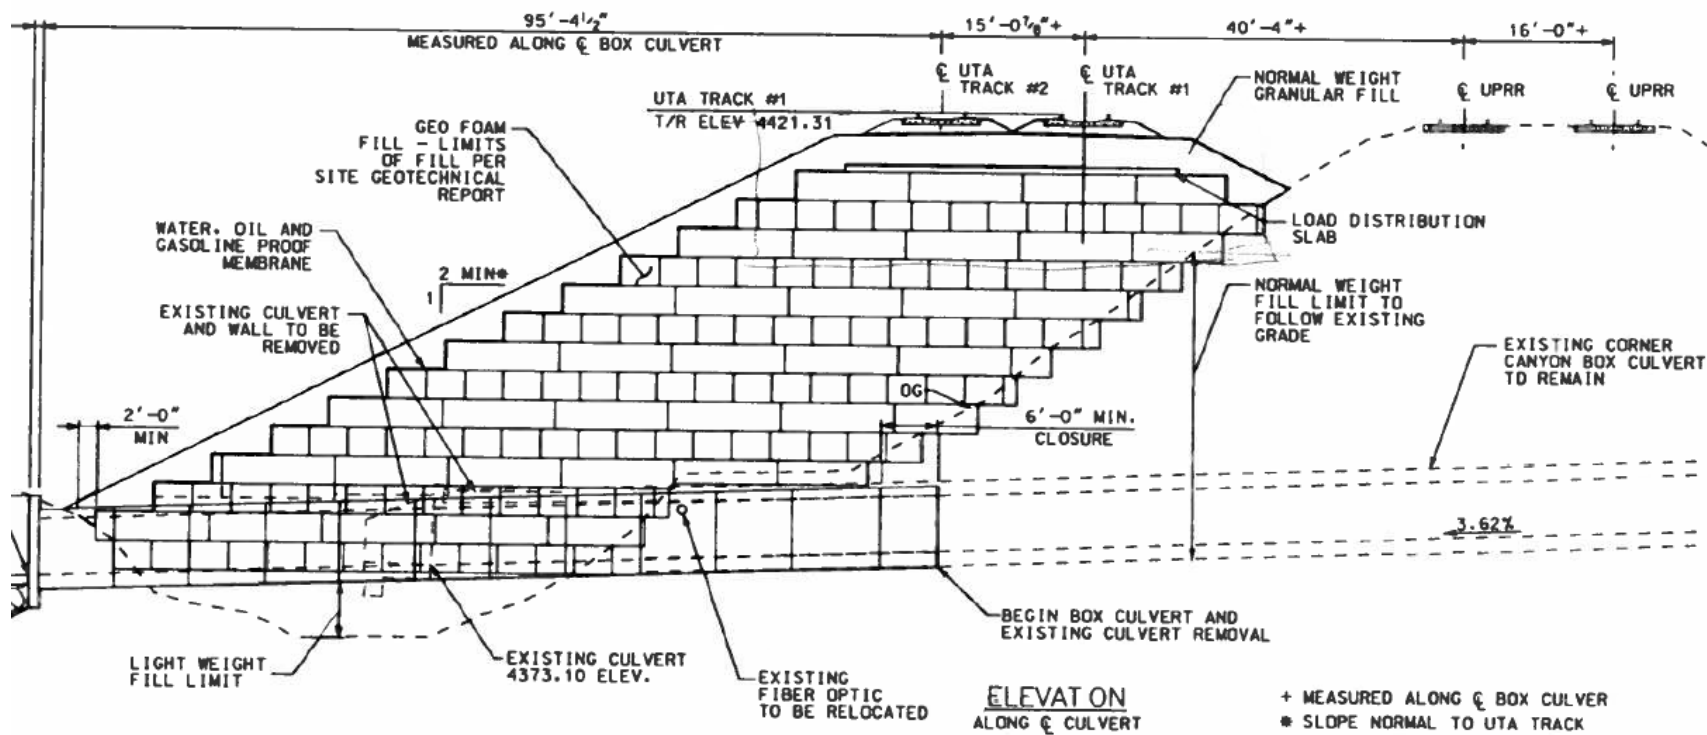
Cross-section of the EPS-supported Embankment at Corner Canyon
